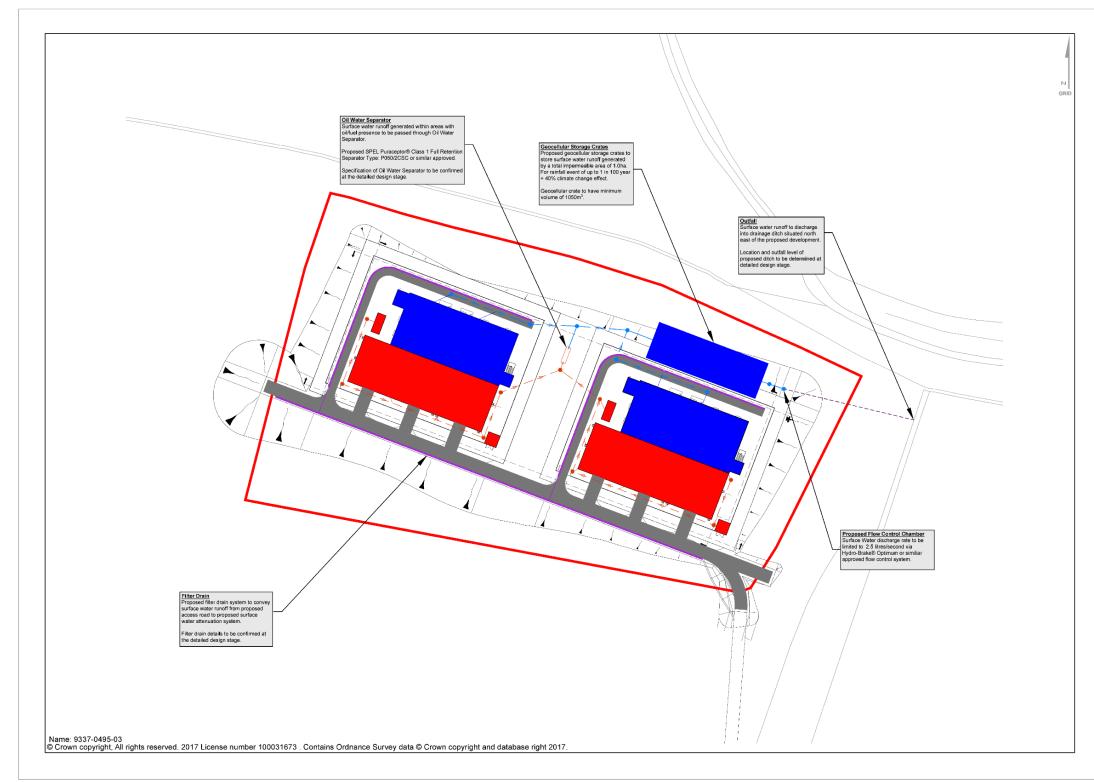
Onshore HVAC Booster Station – Proposed Drainage Layout.
